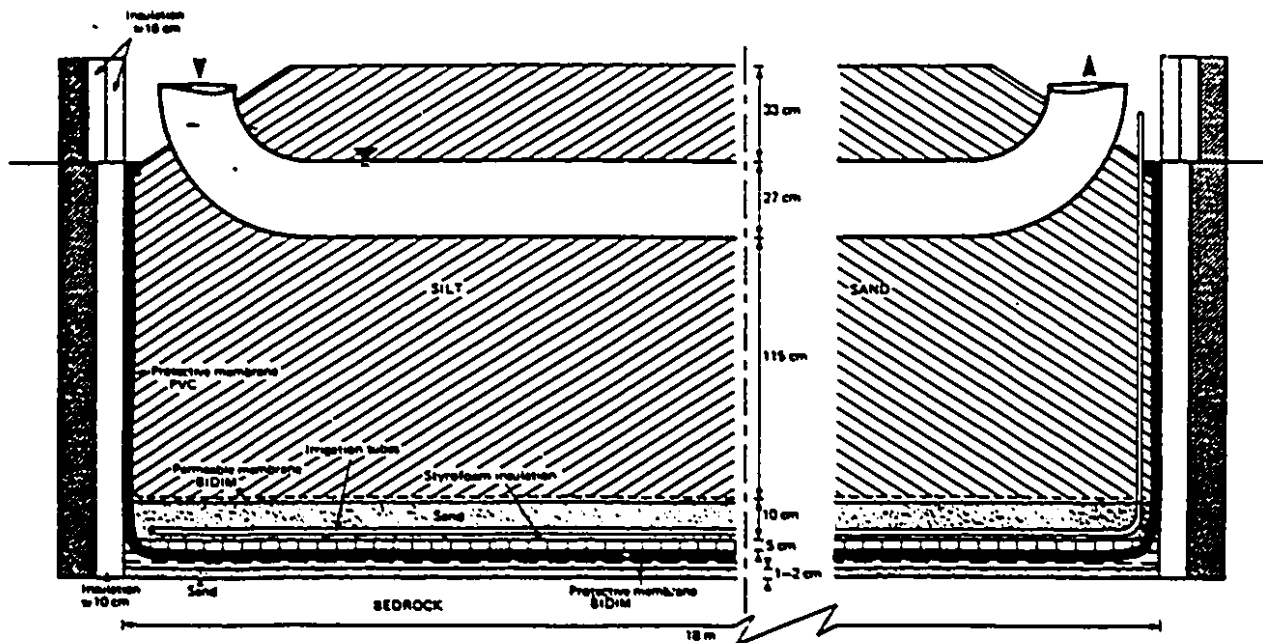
Longitudinal section of Caen test facility (after Dallimore et al. 1984)
